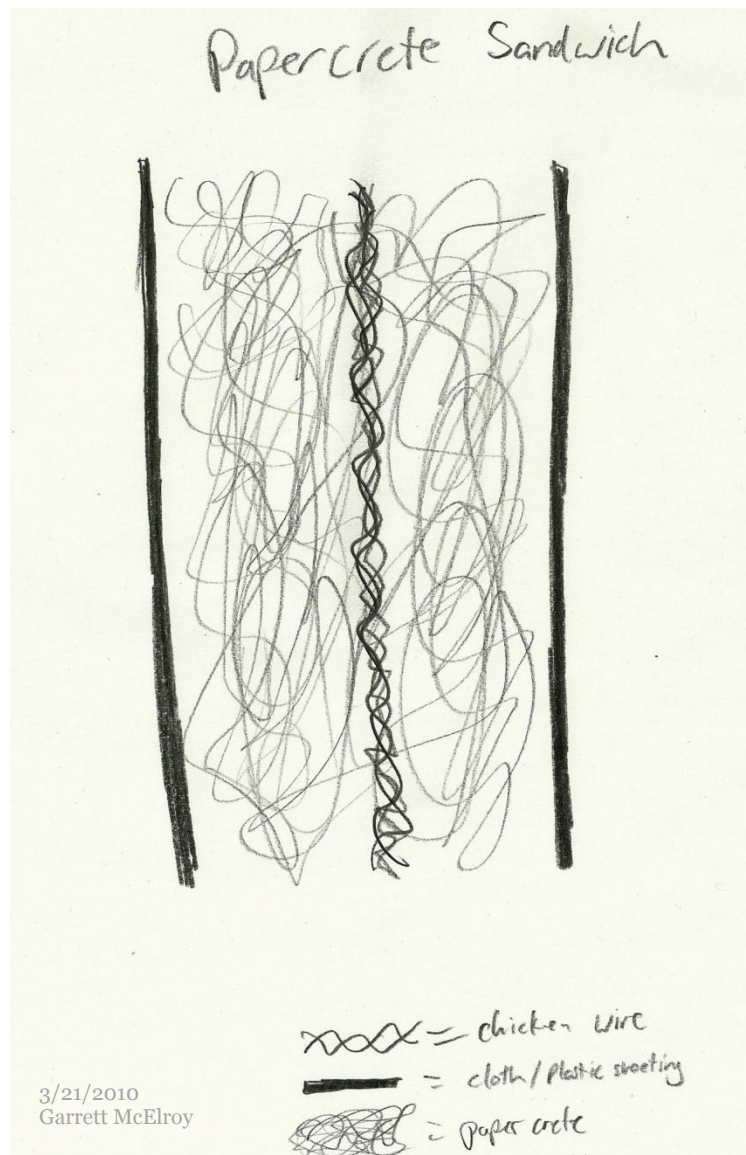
7: This diagram shows a cross-section of sandwiched Papercrete.
